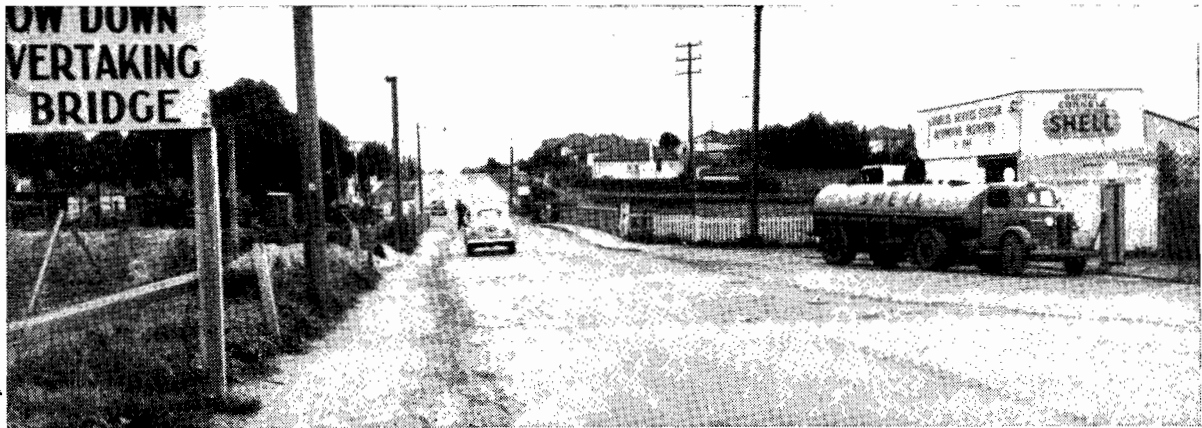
Approaches to old bridge over Merri Creek in Bell Street.
